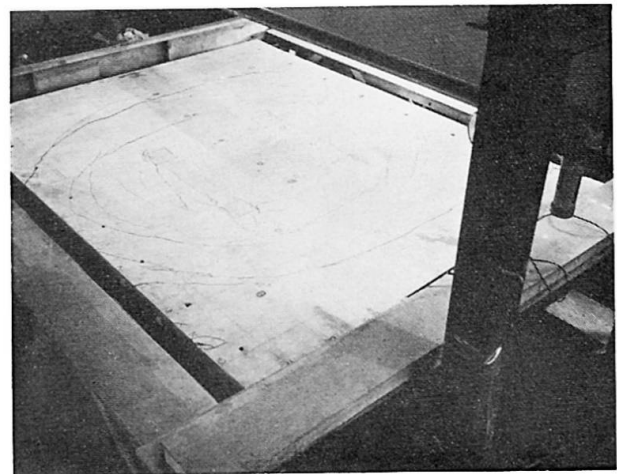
Top surface of slab 2 indicating fixed crack pattern at termination of testing.
